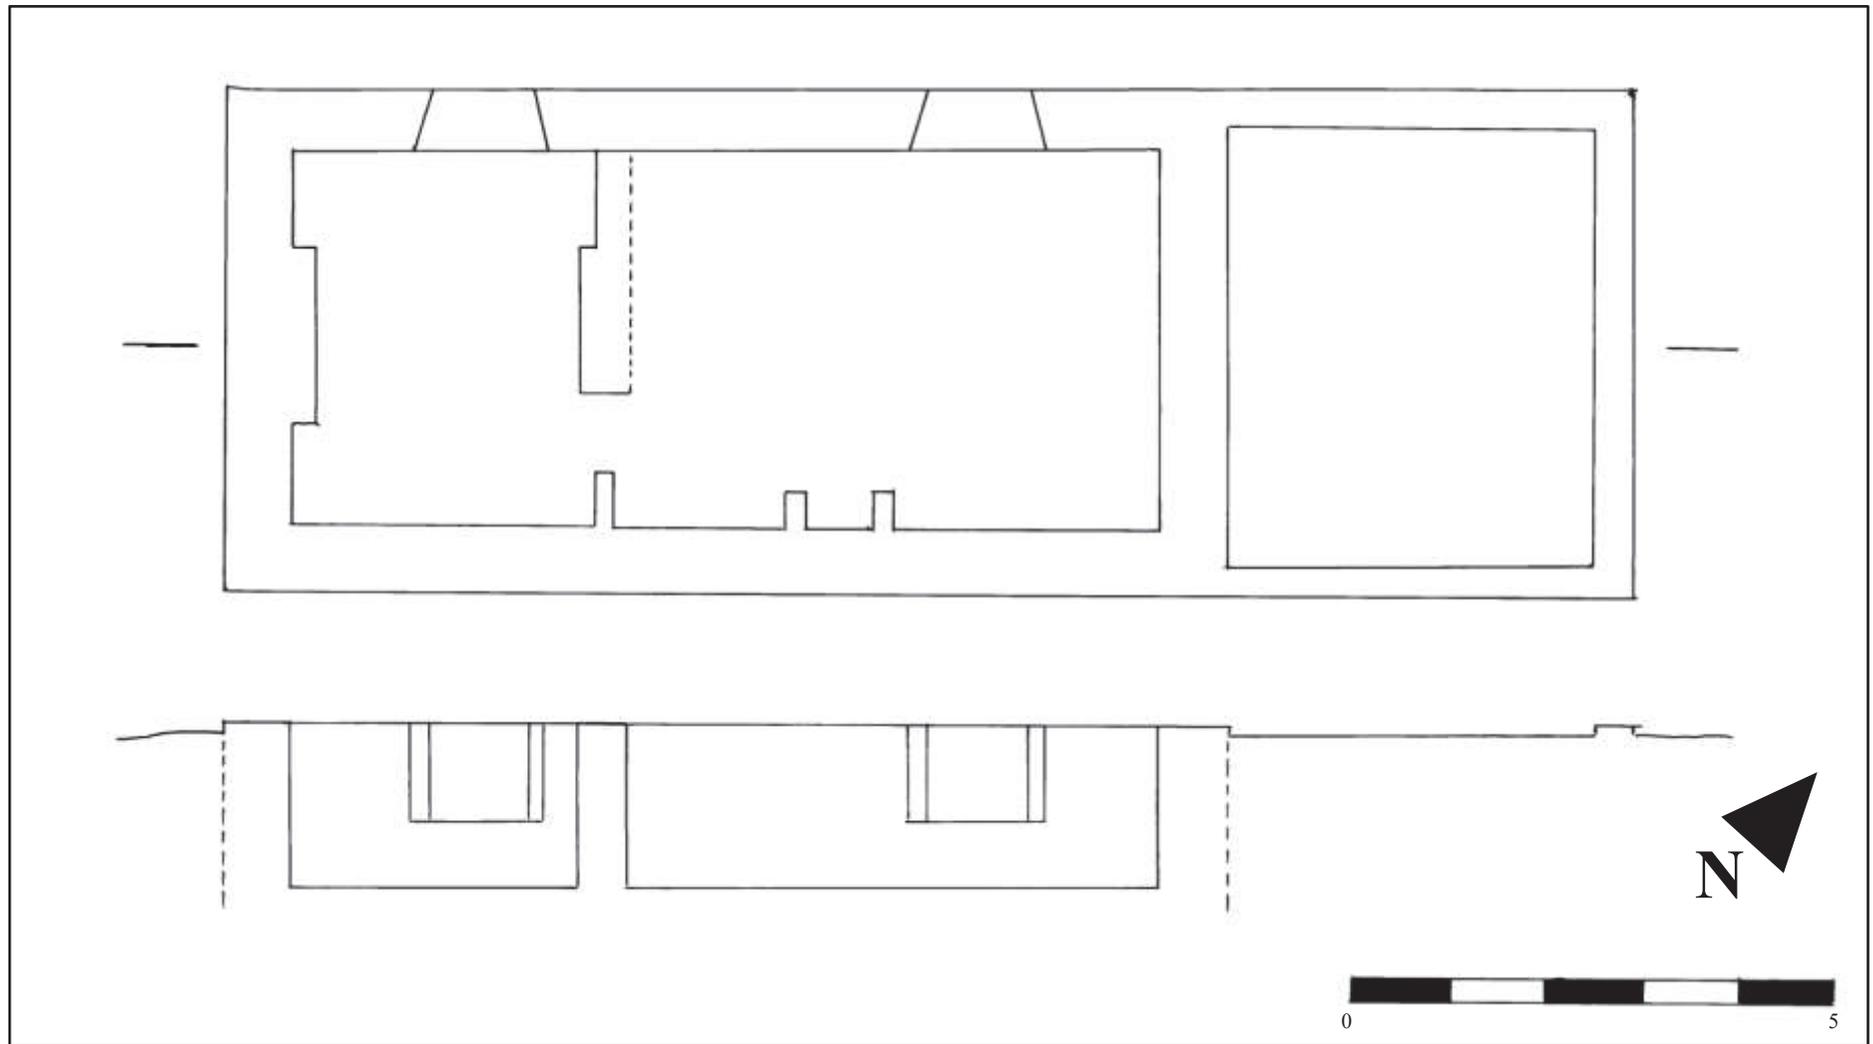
1845 Basement and 1865 extension ground floor plan and elevation (SC3-1) 1:50
